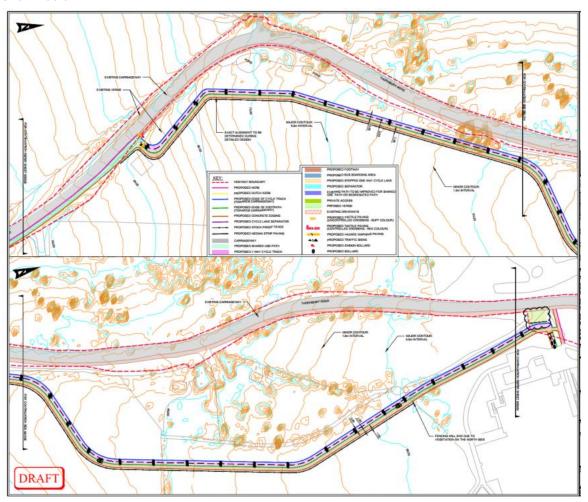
Proposed General Arrangement Layout submitted under pre-application enquiry.
